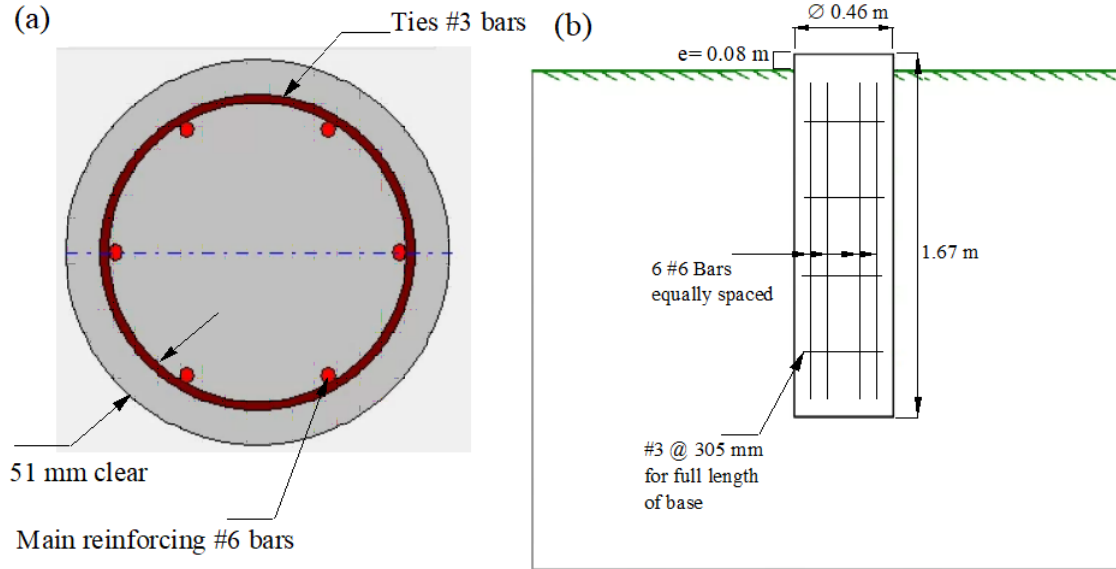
Drilled shaft properties: (a) reinforcement cross-section, (b) side view.
